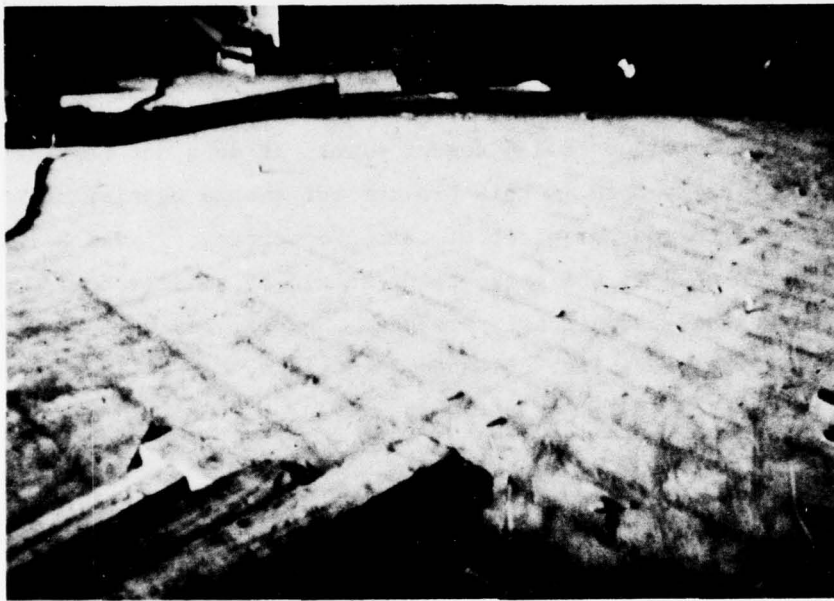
Typical grid pattern in the hardened lightweight concrete floor slabs.
